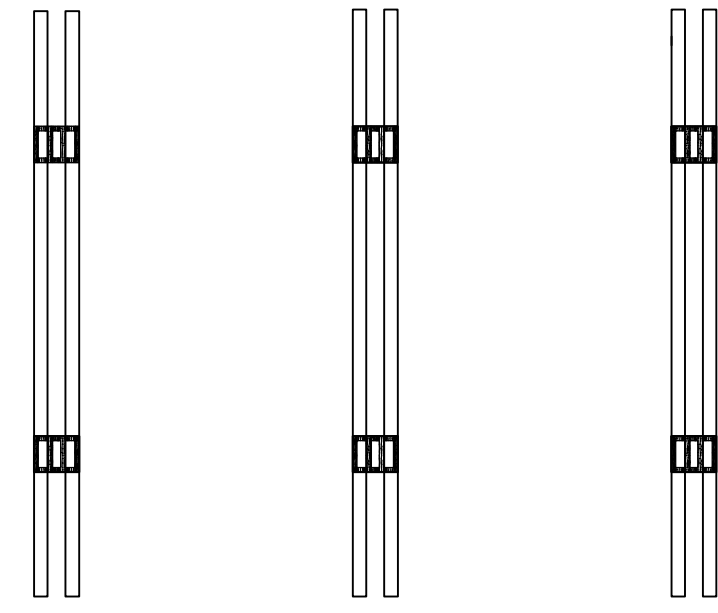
DETAILS A,B - COLUMNS IN MODULAR CONNECTIONS
